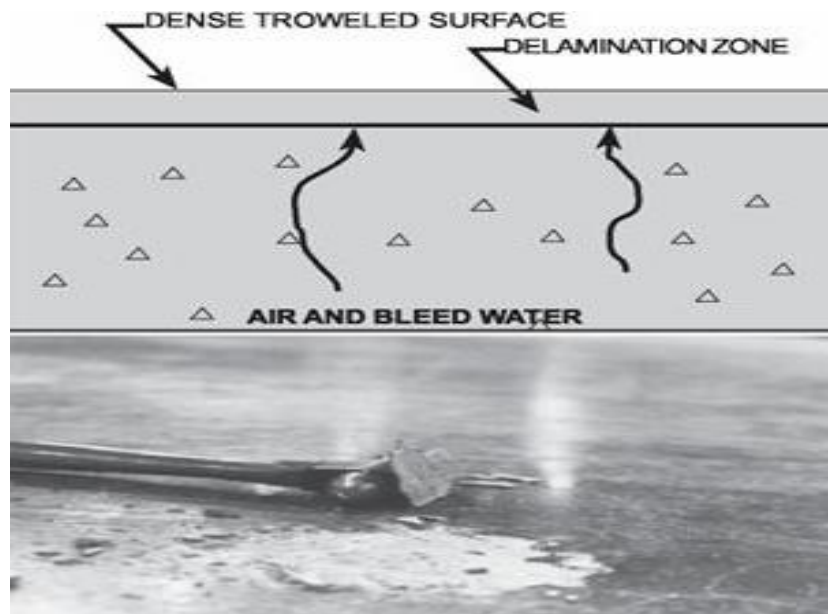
Delaminated Concrete(Concreteanswers.org)
